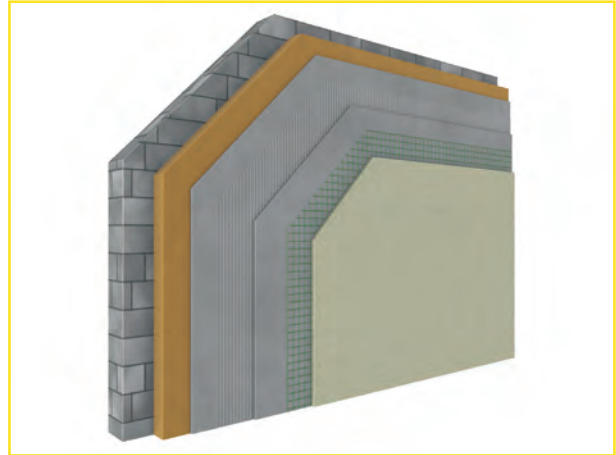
Possible wall construction in the outside area (with additional reinforcement fabric!)
